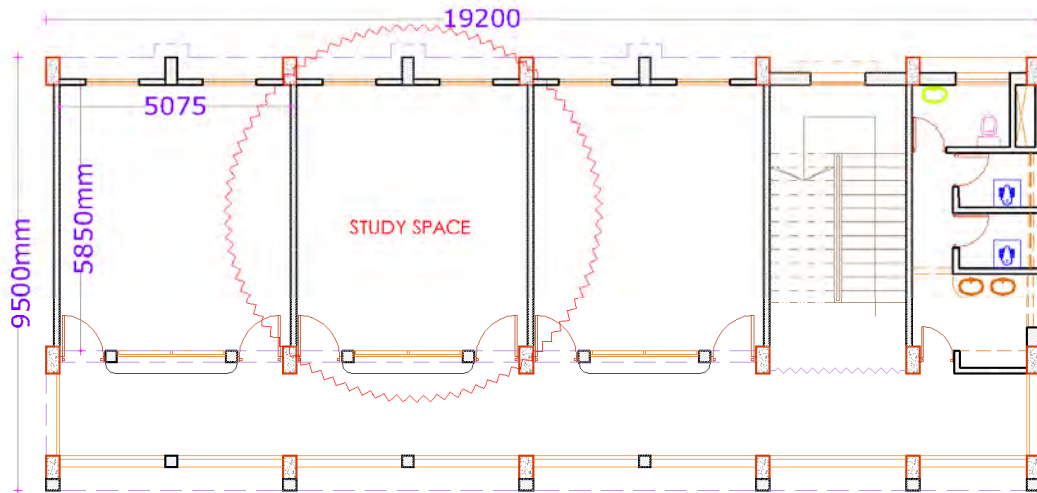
Site Plan of case school building Paikpara Government Staff Quarter Primary School
